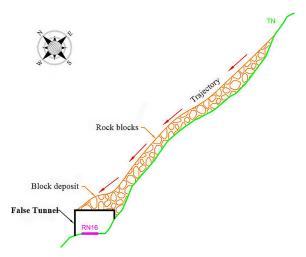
Typical cross-section on Section 2 for Solution 2 (false tunnel)
